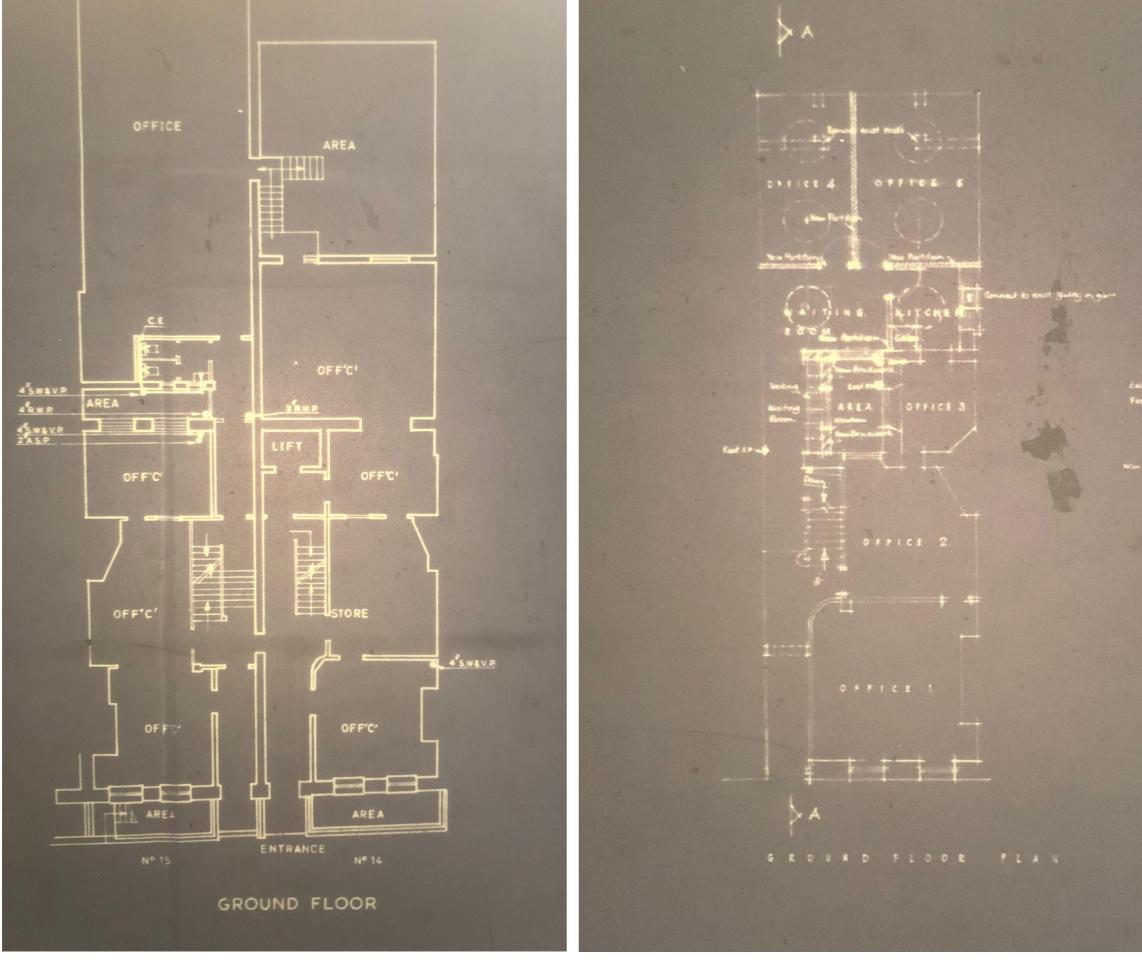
1965 Drainage Plan showing ground floor layout of nos. 14 & 15 Greats James Street
